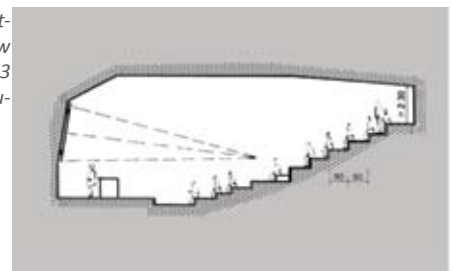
Sectional drawing demonstrating a standard lecture theatre shape.
